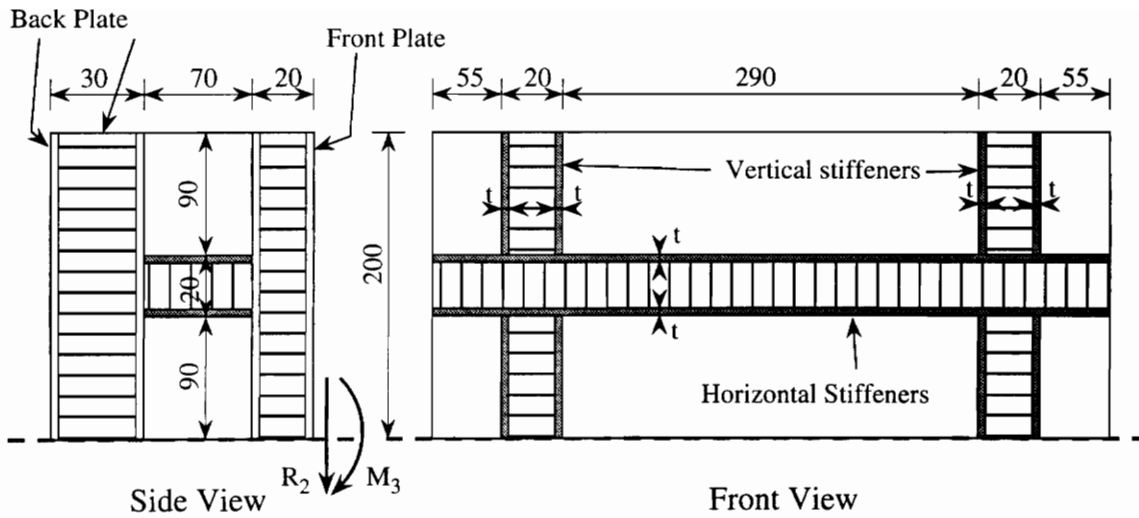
Stiffeners layout of the interface (dimensions in mm).
